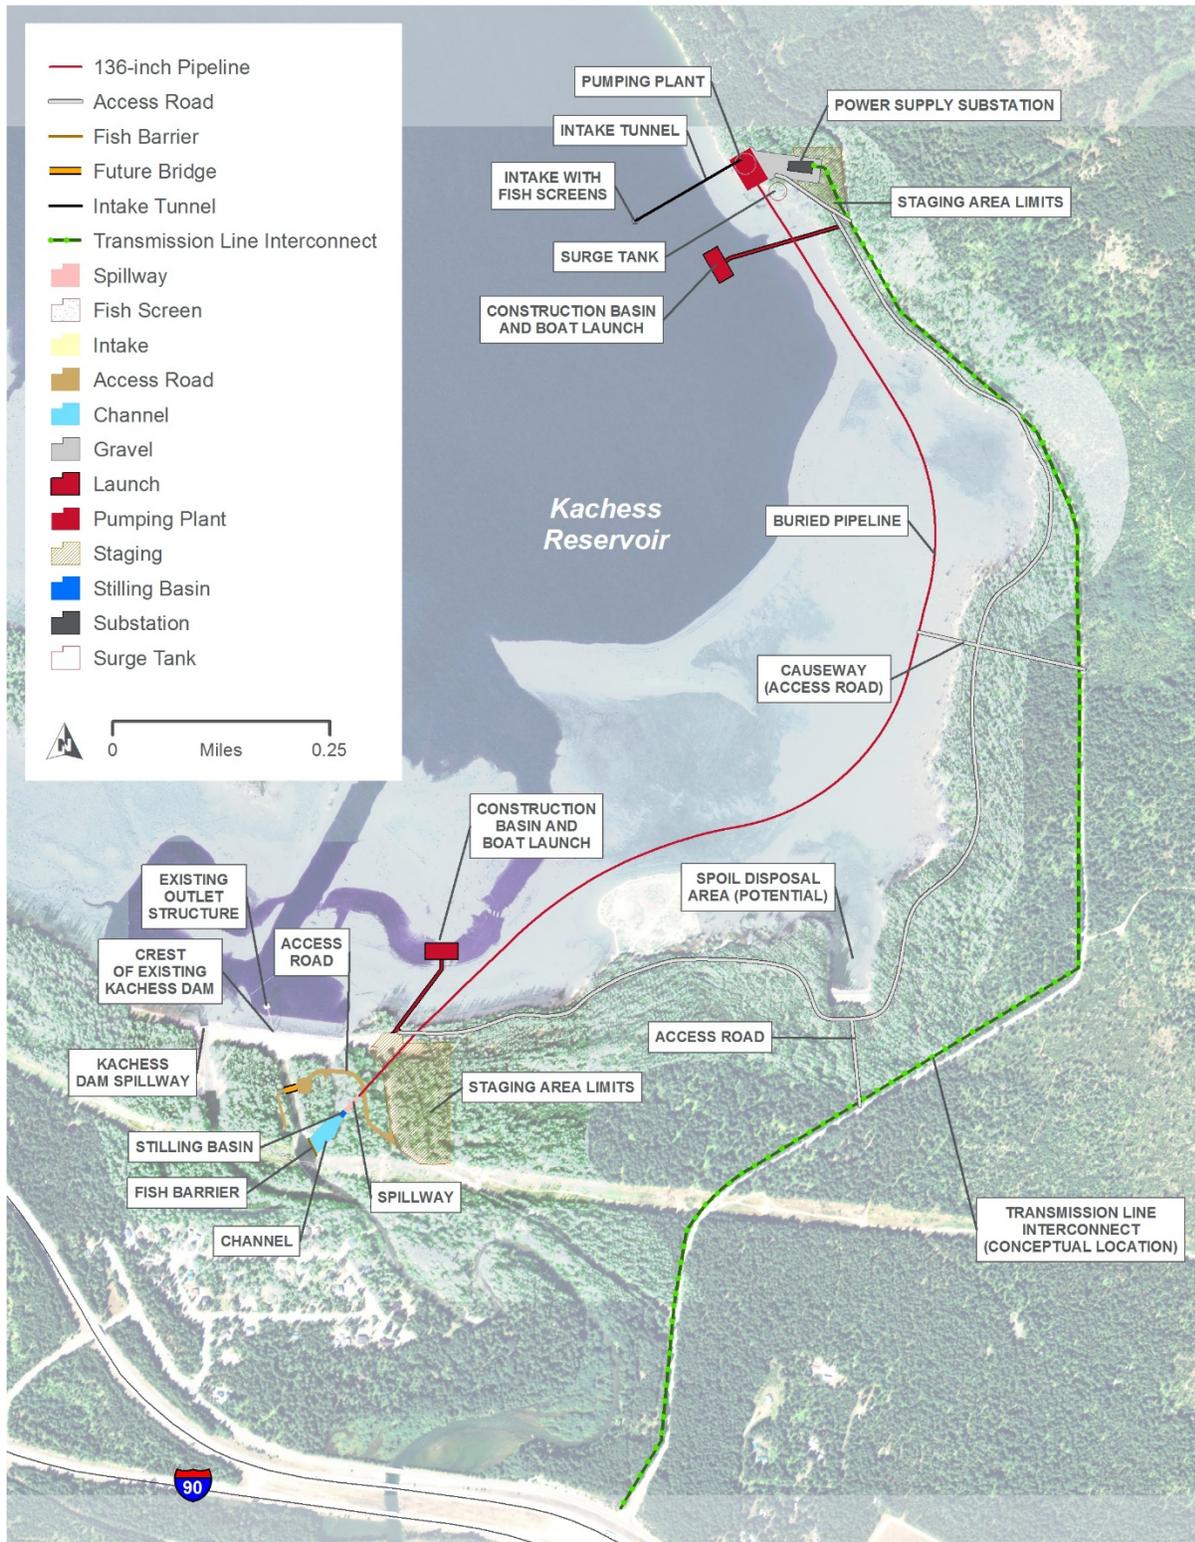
Alternative 2 – KDRPP East Shore Pumping Plant Overview
